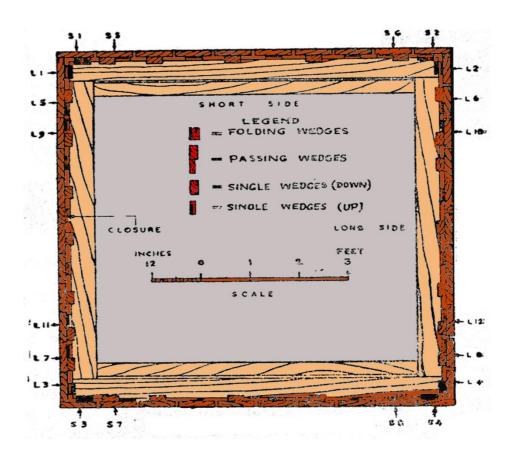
D1-4: Plan of Standard 9 Foot x 8 Foot Shaft
